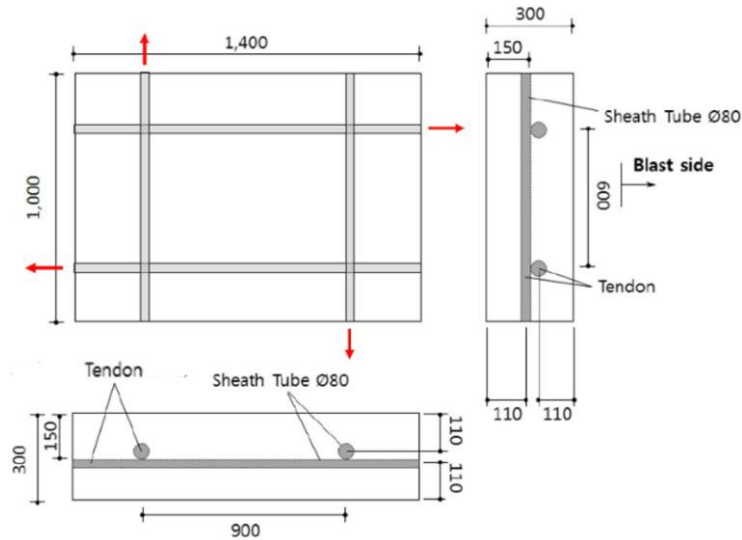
6 Dimension and reinforcement of prestressed concrete slab in explosion test [261] (unit: mm).
